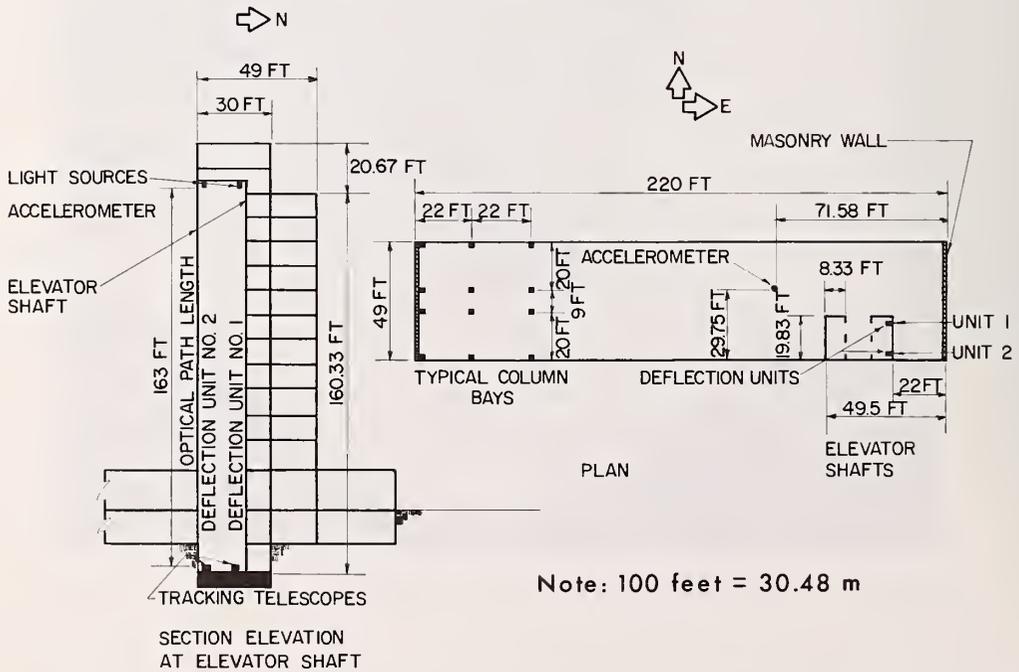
PLAN VIEW AND SECTION ELEVATION OF ADMINISTRATION BUILDING
